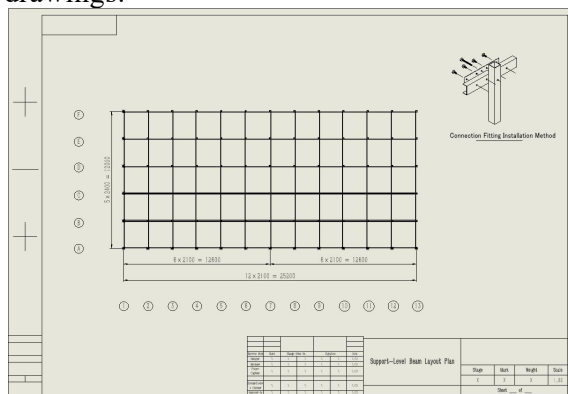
Automatically Generated Engineering Drawing of the Cooling Tower Support Frame
